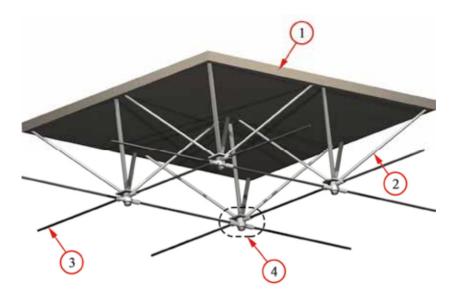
Segment of The flat double-layer grid-cable steel-concrete composite structure: 1 - a top chord; 2 - a diagonal; 3 - a bottom chord; 4 - a nodal bolted connections
